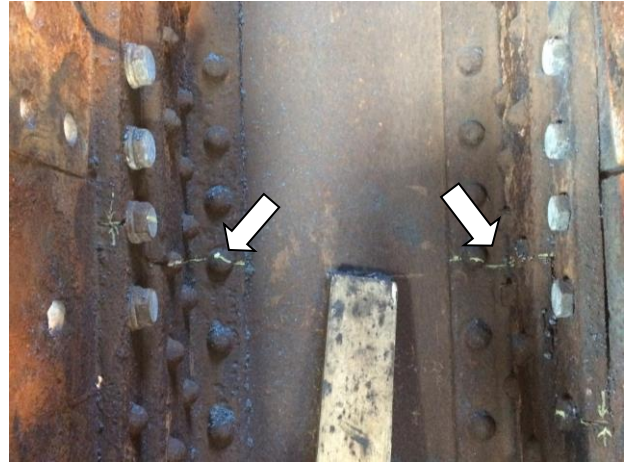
Cracks in the north truss member observed after rack segment removal.
